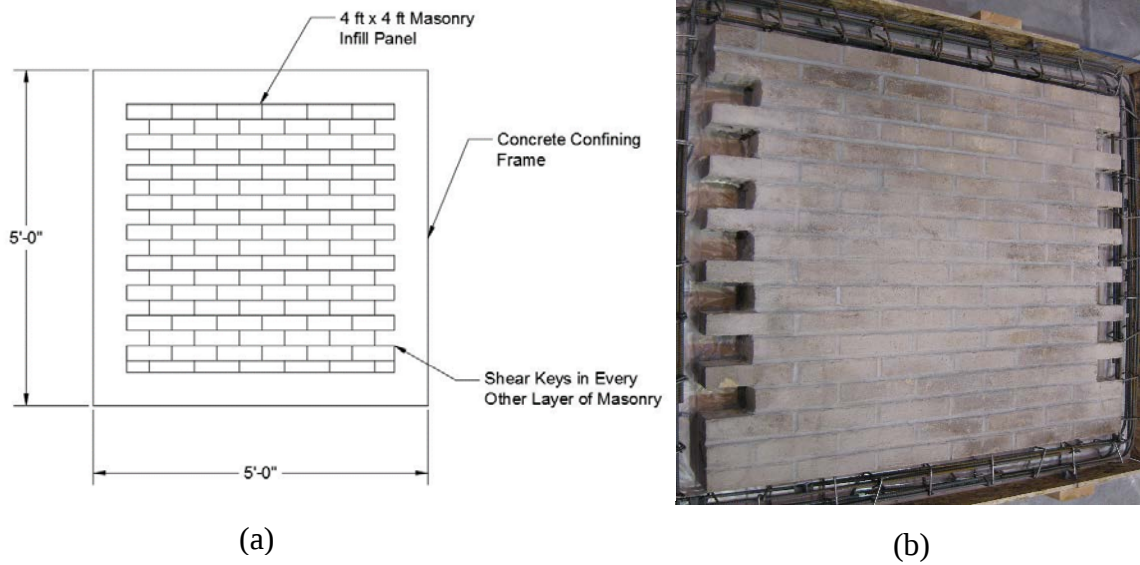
Plan view of confined masonry wall as a (a) reference image and (b) mid-construction
